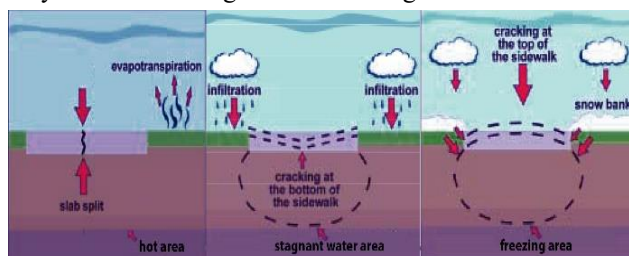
Causes of sidewalk surface damage (Source: Author)
